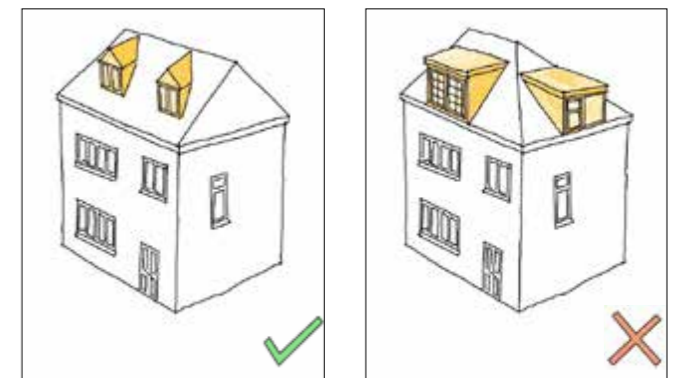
Getting the architectural detail right will be critical for features such as dormer windows
